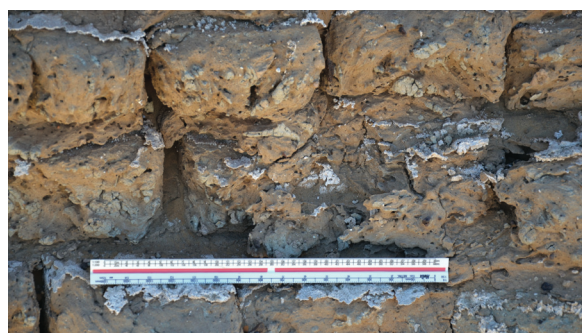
Building mortar in the northern wall and sample at site MRB-05-001.
